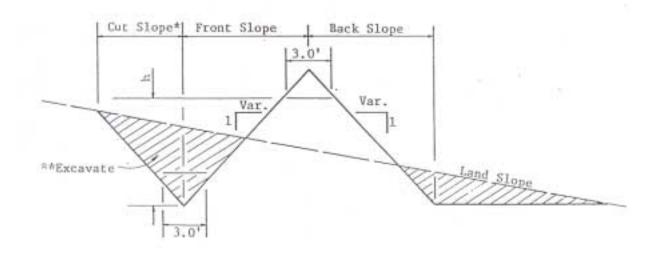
FIGURE B. Minimum Dimensions for Grassed-Back Terraces
